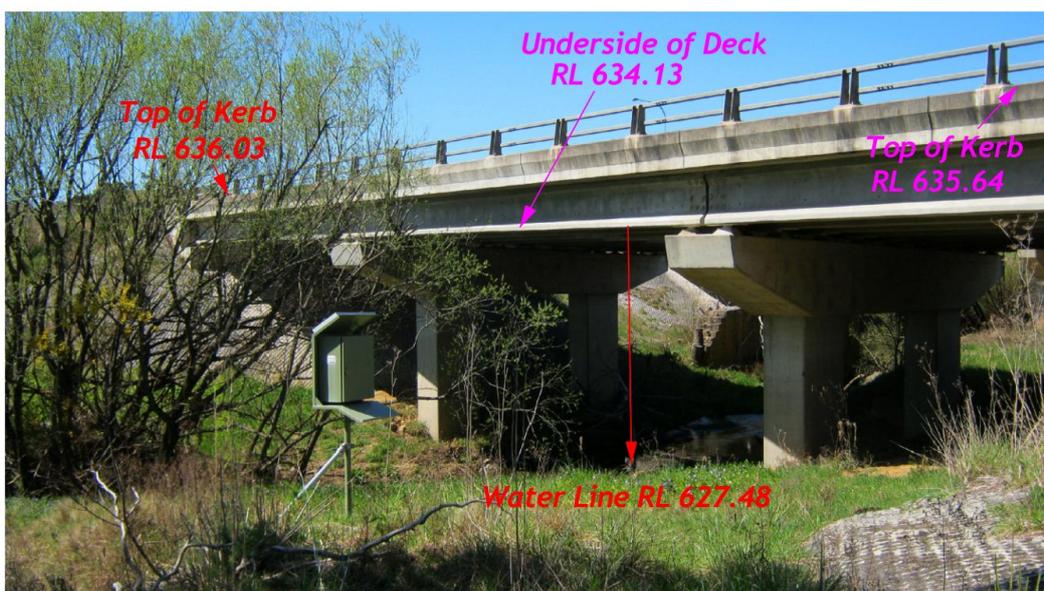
Hume Highway Three Legs O'Man Bridge (northbound looking upstream)
